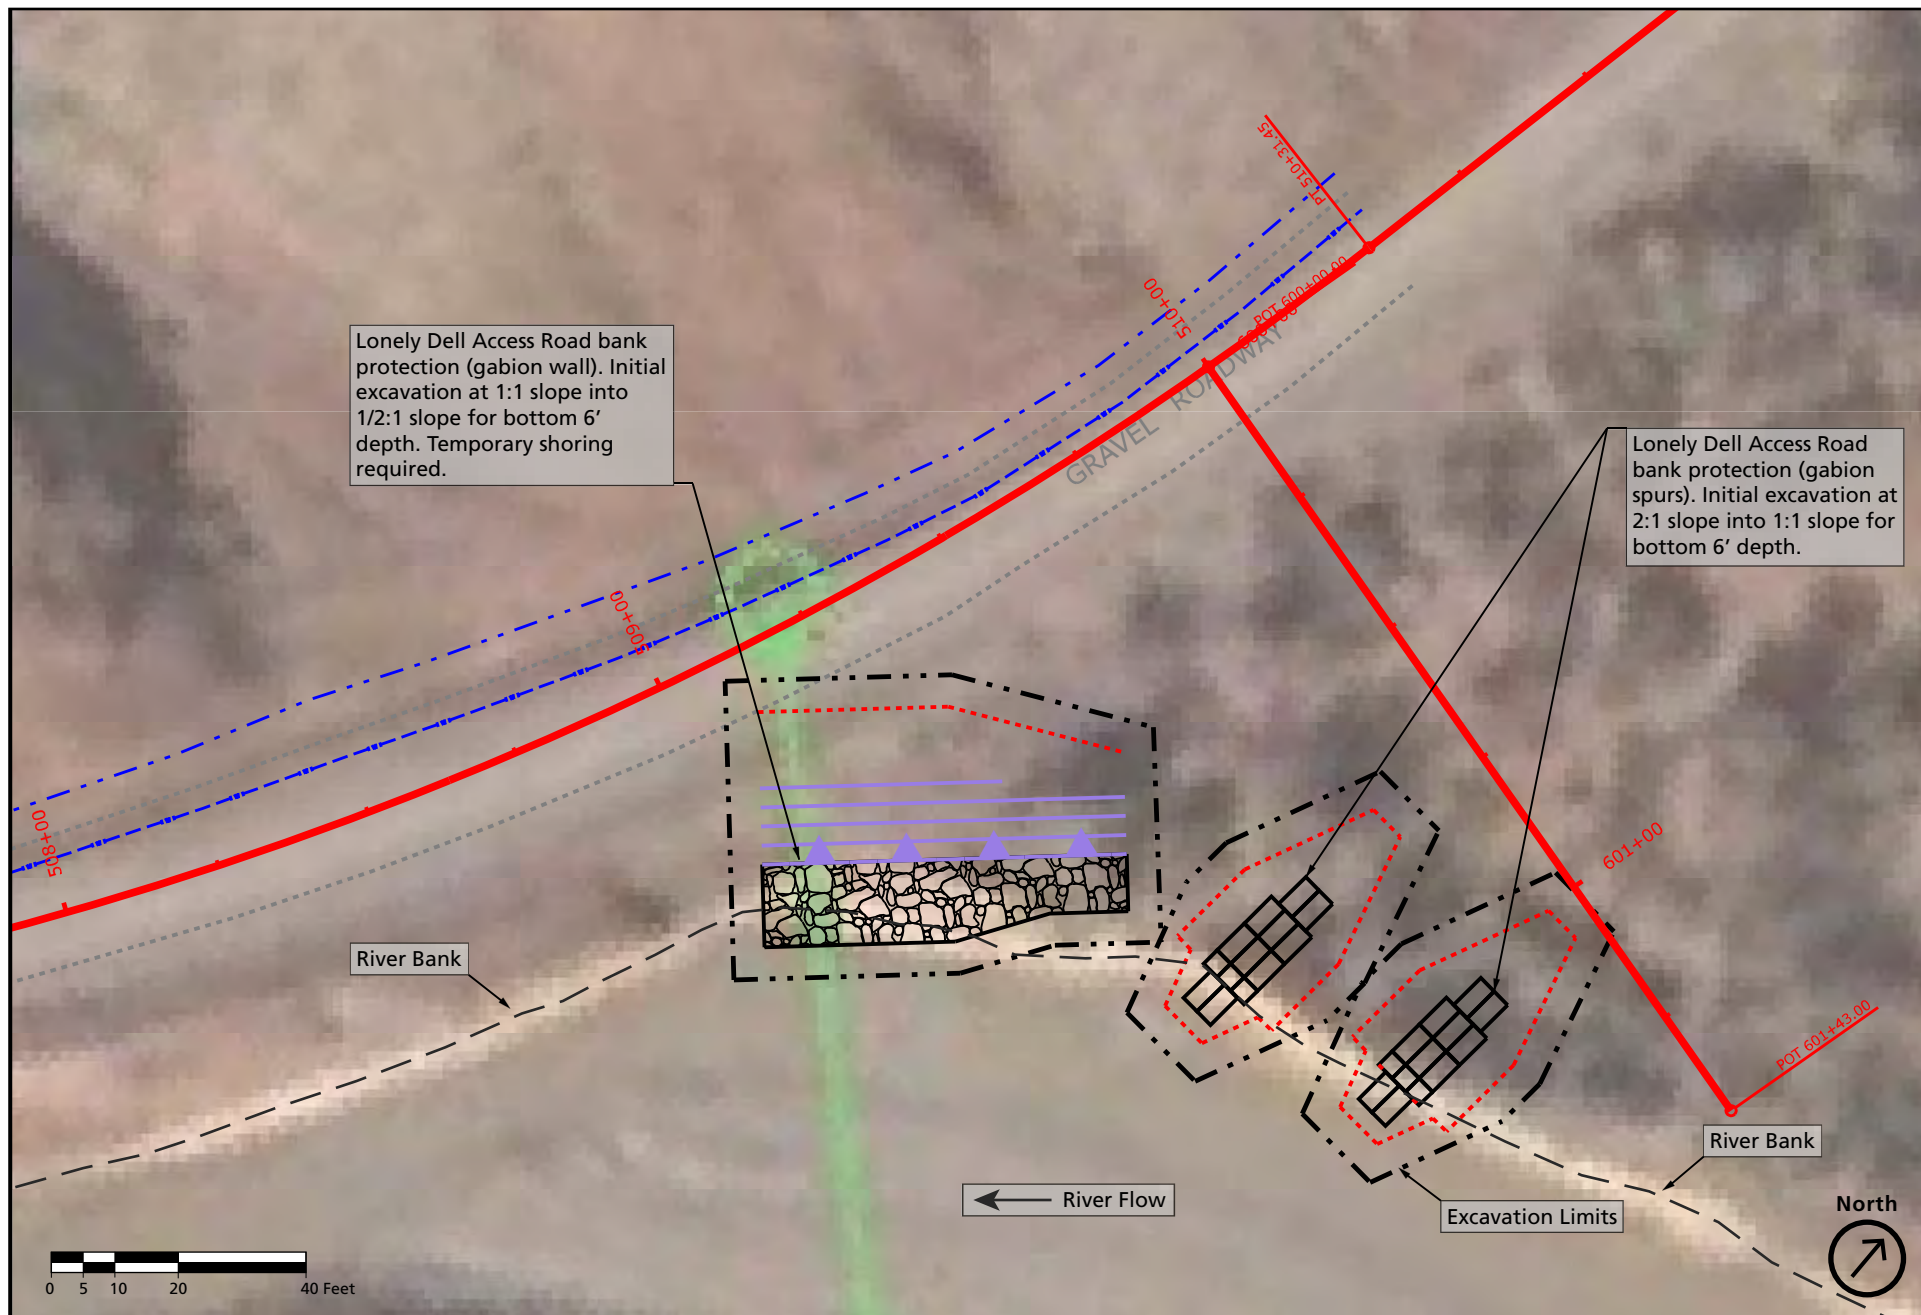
Lonely Dell Access Road Bank Repairs / Protection
